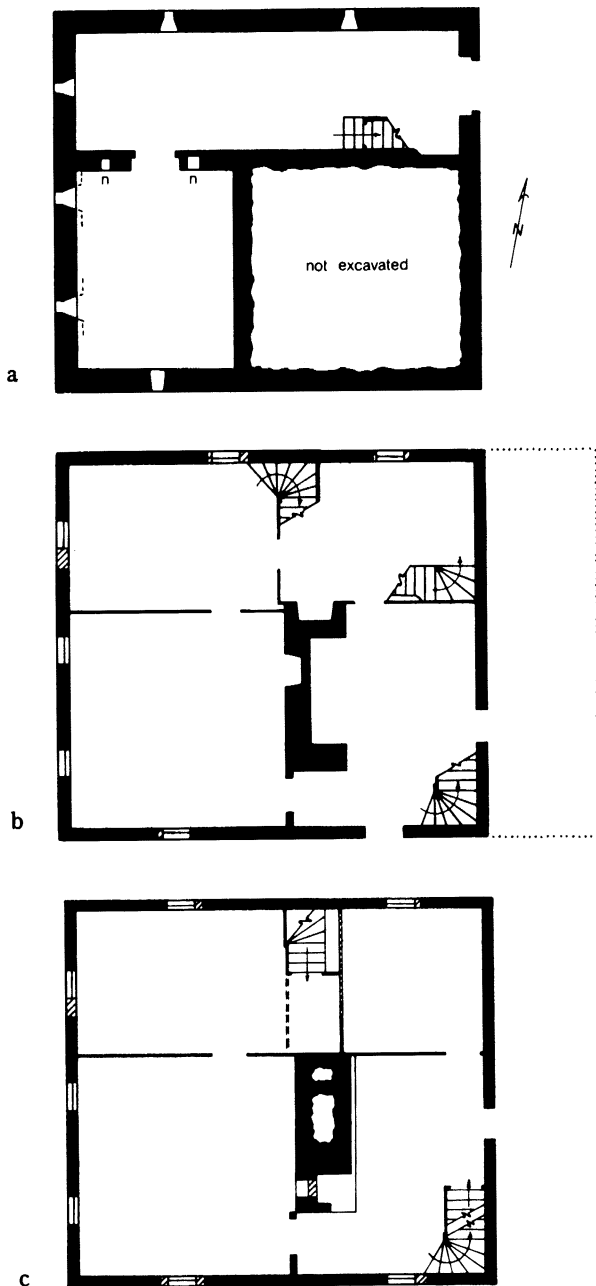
Fort Egypt. Cellar, first-, and second-floor plans. From 1940 Historic American Buildings Survey plans, revised by author.
